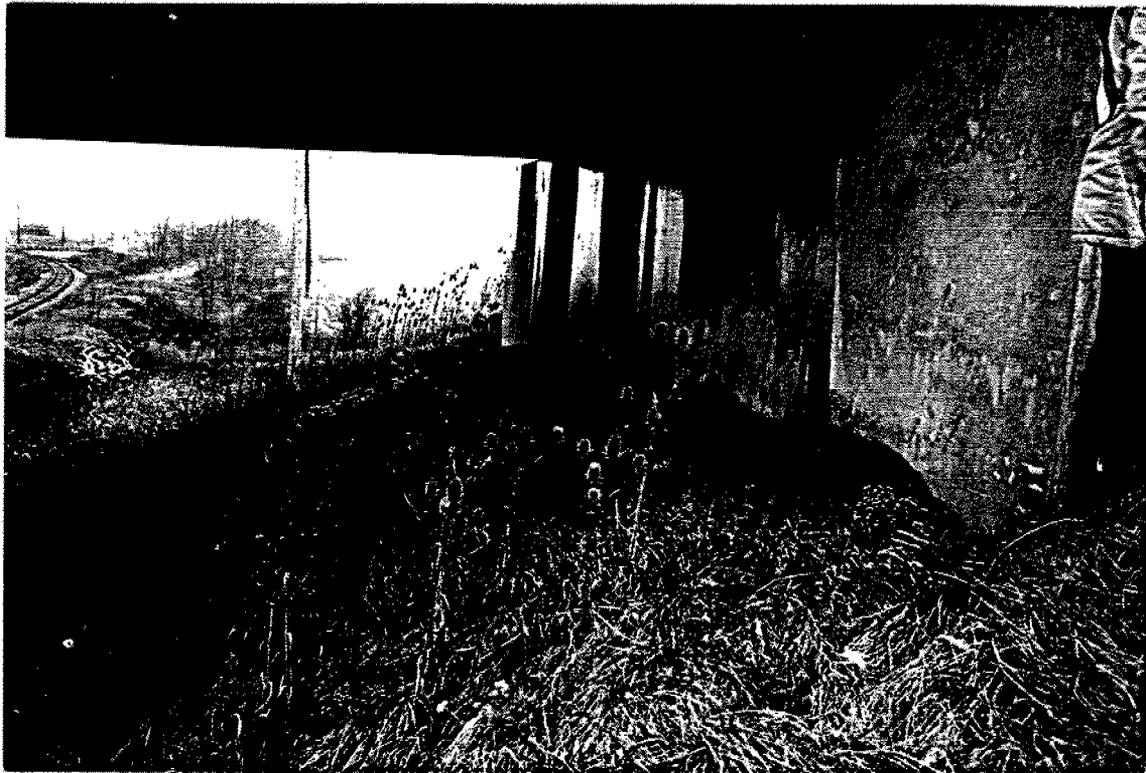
NORTH ABUTMENT (LOOKING WEST)
